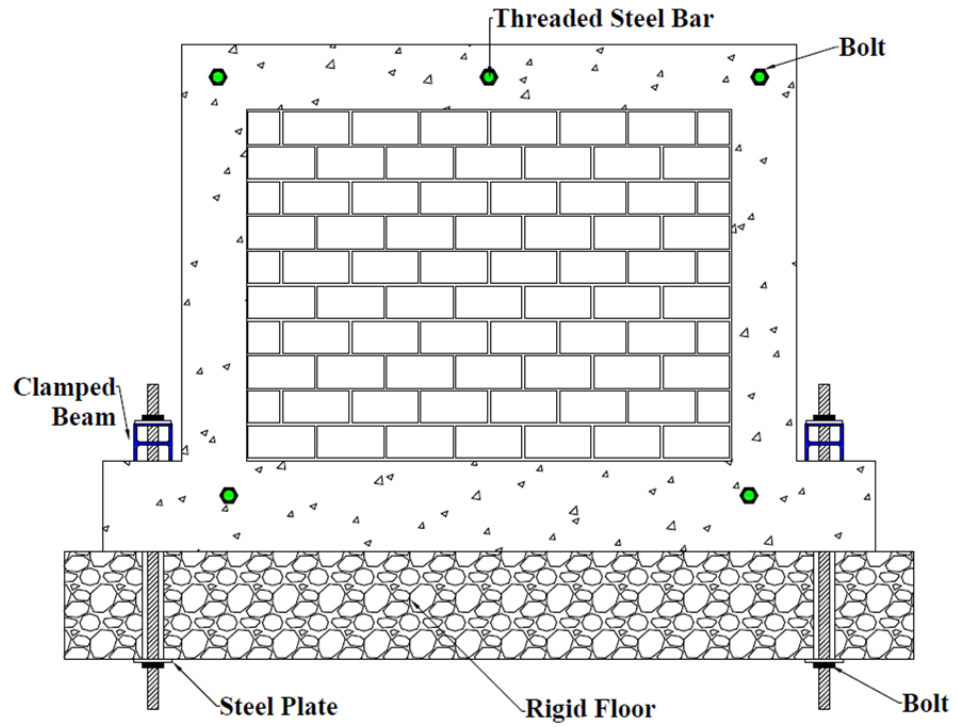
Schematic Front View of Test Set-up for RC Infilled Frame Specimen
